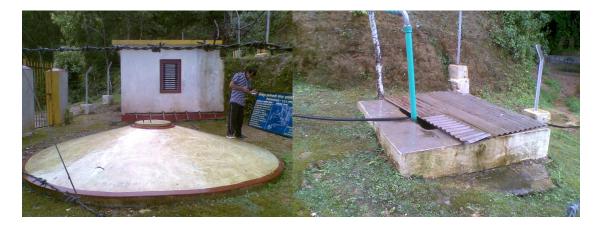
View of 1st RVT and Pump House; proper fencing donePhoto 4:Pumping Chamber which needs concrete slab cover for water safety.
